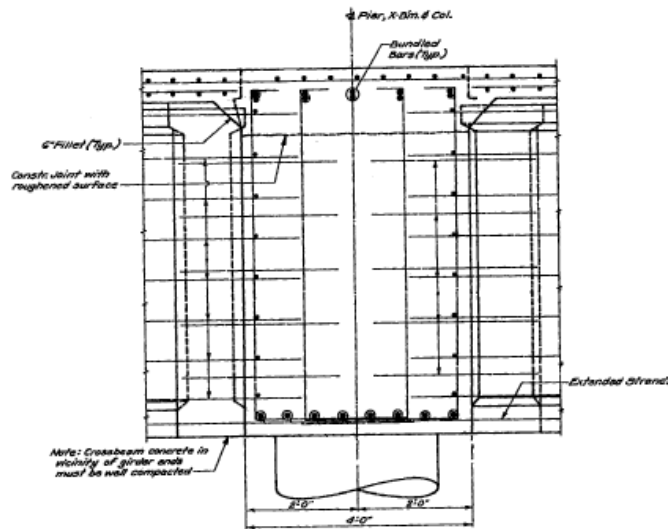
Cross Section of Cross Beam of Bridge 5/826
